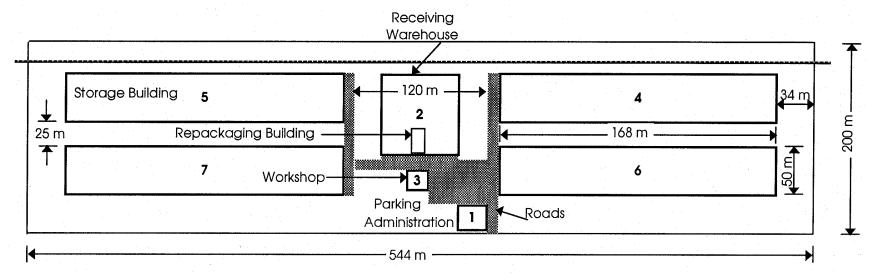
Site Layout of the Building Storage Facility — Uranium Metal, 50% Case
